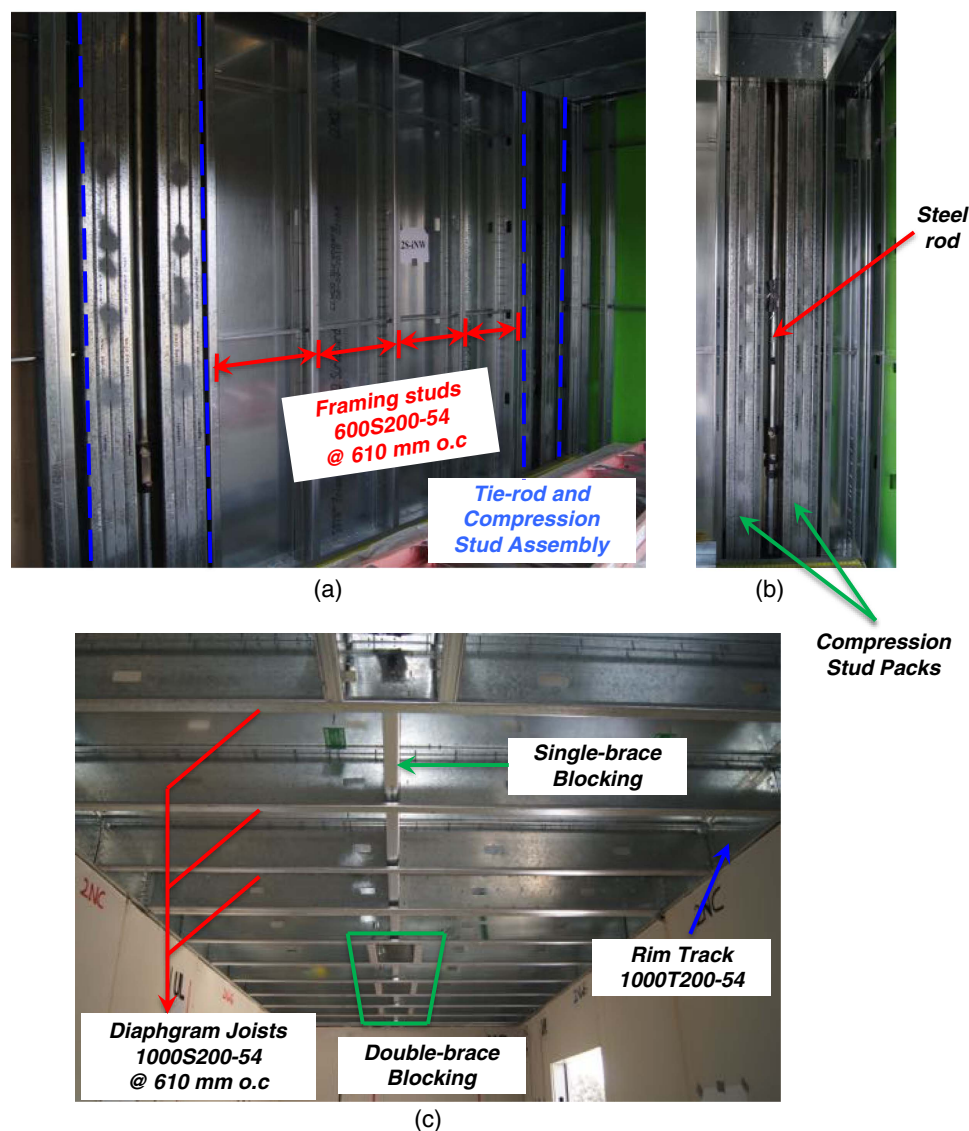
Structural components framing details: (a) corridor shear wall; (b) tie-rod and compression stud assembly; and (c) floor diaphragm. (Images by Xiang Wang.)
